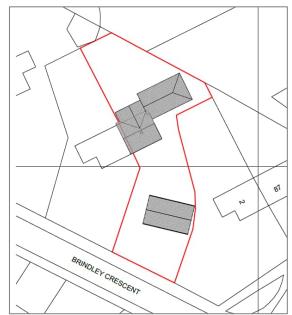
Extract from submitted plan showing relative positions of the additions proposed within the plot
